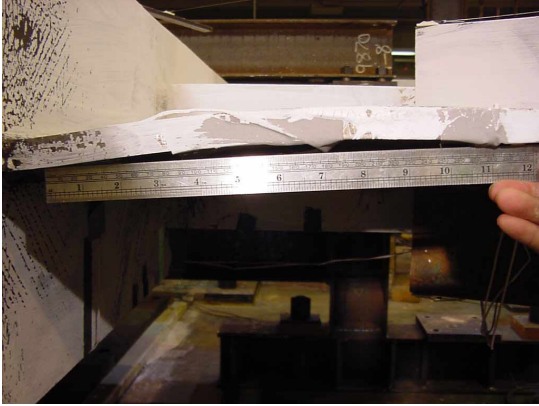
Top Gusset Plate Buckling, Test No. 2
